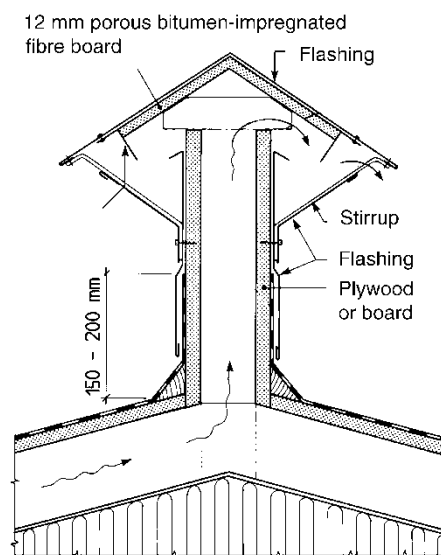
Continuous, longitudinal ventilation louvre along the ridge of an insulated, ventilated pitched roof. Source: NBI (2000)
